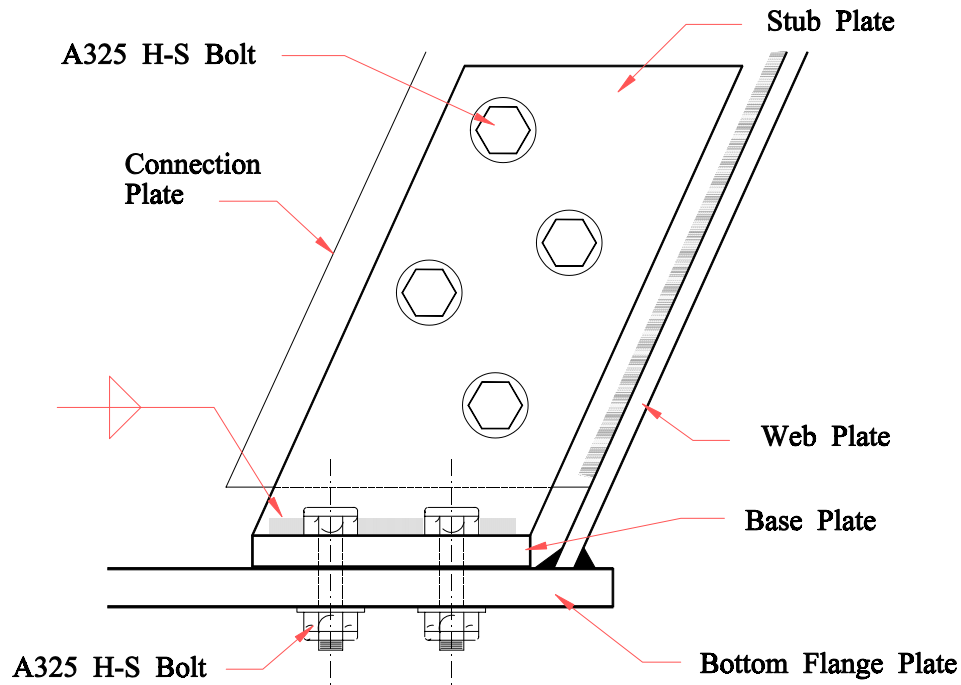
Fabricated stub plate for trapezoidal boxes.
